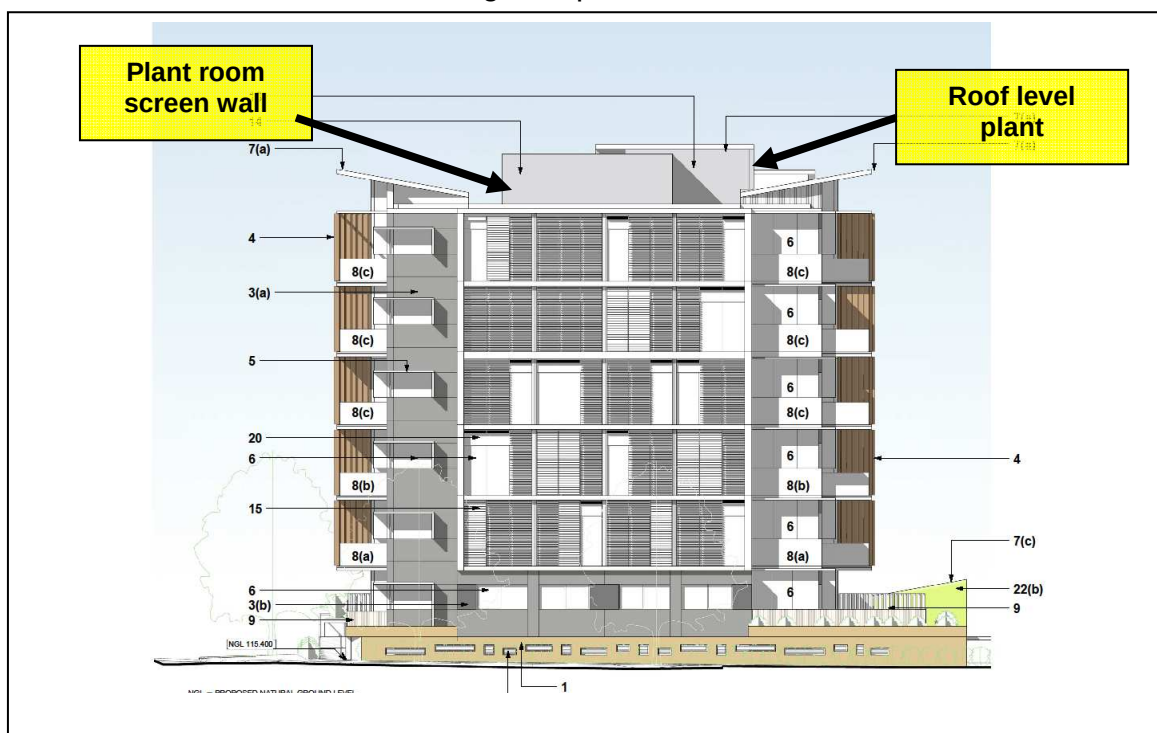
Section of buildings 4 & 5 illustrating location of roof plant
